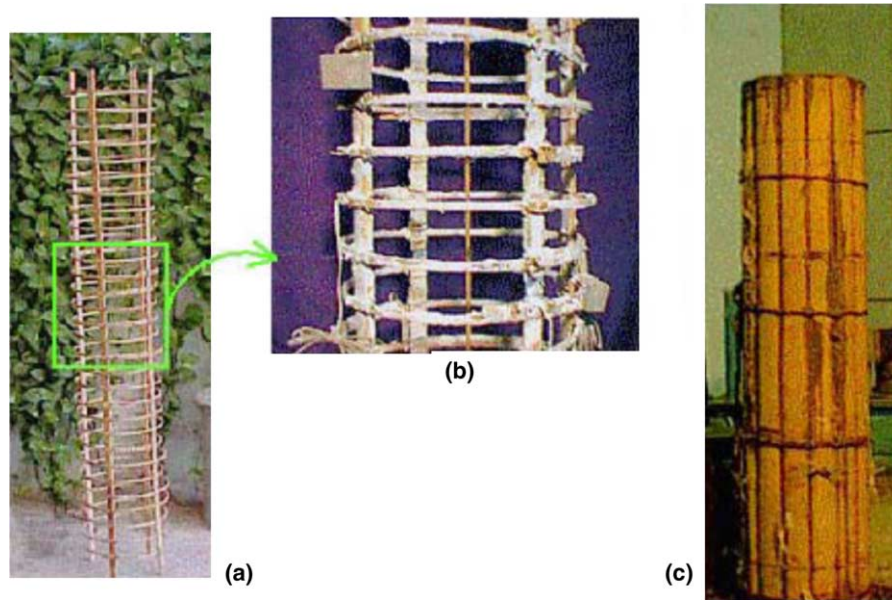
Circular bamboo reinforced concrete column with permanent shutter: (a) column reinforcement, (b) details of reinforcement and (c) final product.
